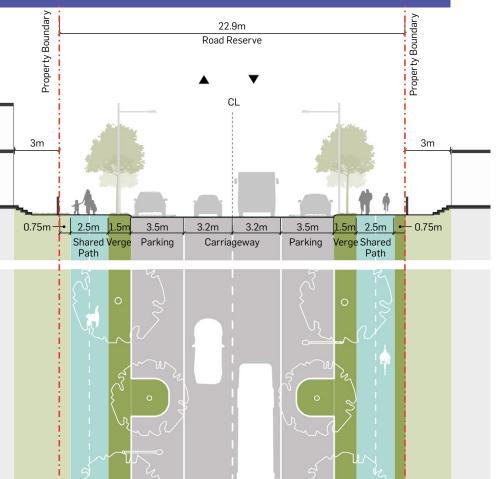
Indicative Street Section B-B' - Sub-Arterial Road - Type 2A
